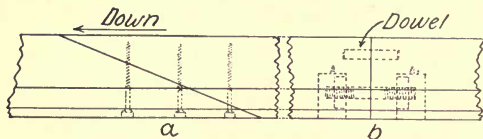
METHODS OF SPLICING HANDRAILS.
